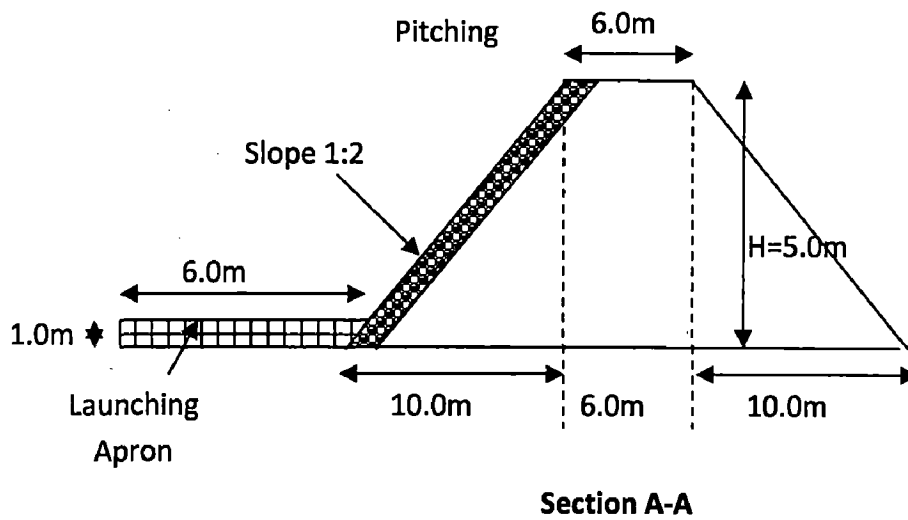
Tentative Details Showing Guide Bund Section at Project Site
